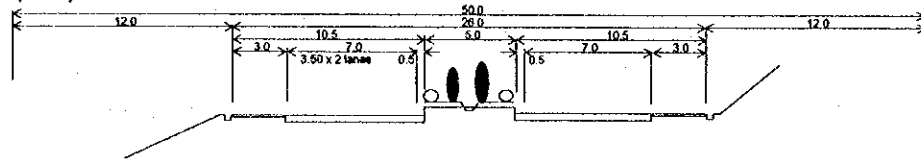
Typical Road Cross Section Plan by Road Classification
